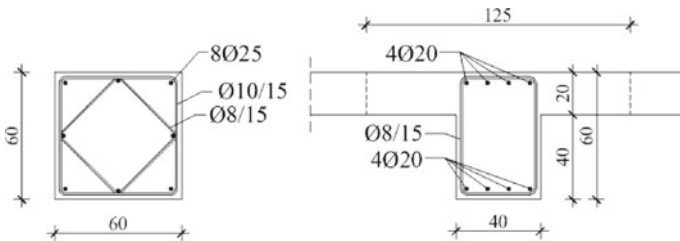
Cross-sections of columns and beams with steel reinforcement
